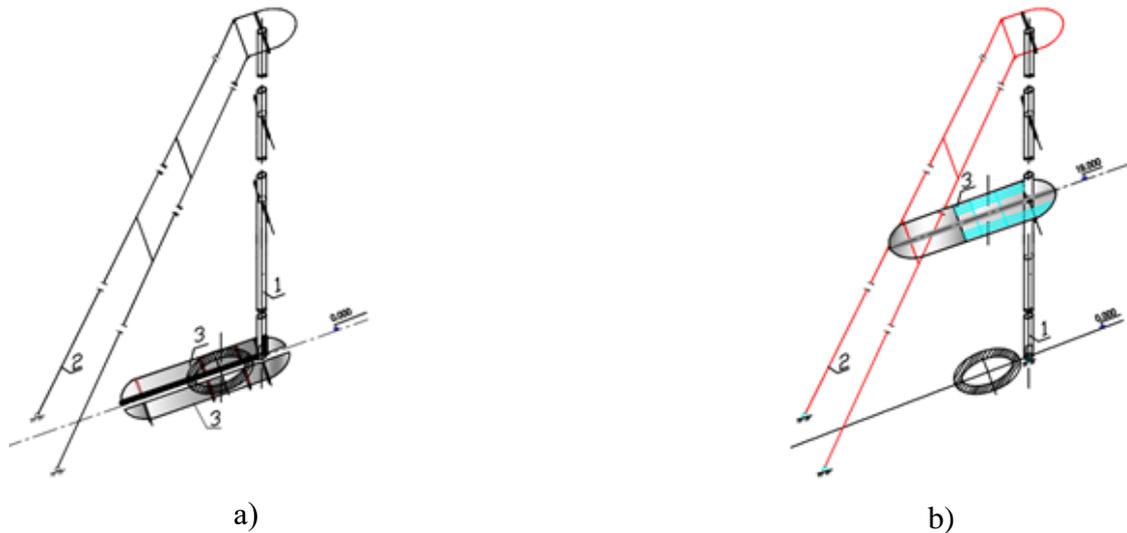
Scheme of assembly of the driving sheave wheels platform: a – assembly on the ground; b – lifting to the design position; *1* – central tubular post; *2* – stay leg, *3* – the driving sheave wheels platform
